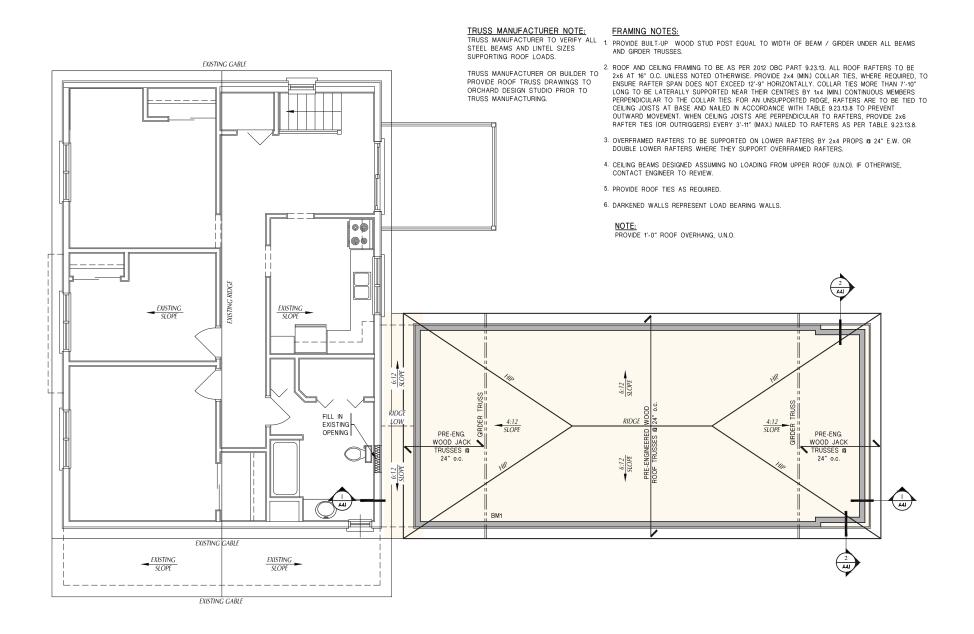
Ground Floor Plan prepared by Orchard Design Studio Inc
